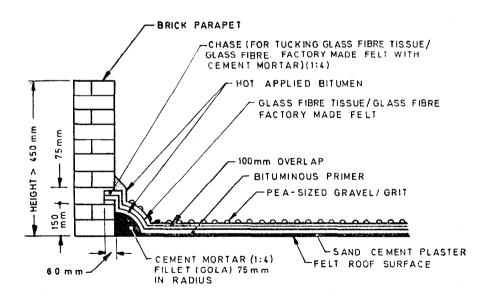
Waterproofing on a Flat Roof with Brick Parapet Over 450 mm in Height-Typical Details
